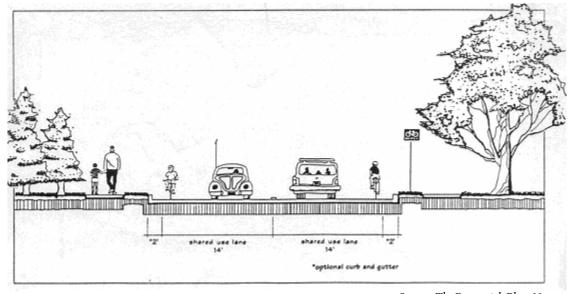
LOS 4-SHARED USE ROAD AND STANDARD SIDEWALK
